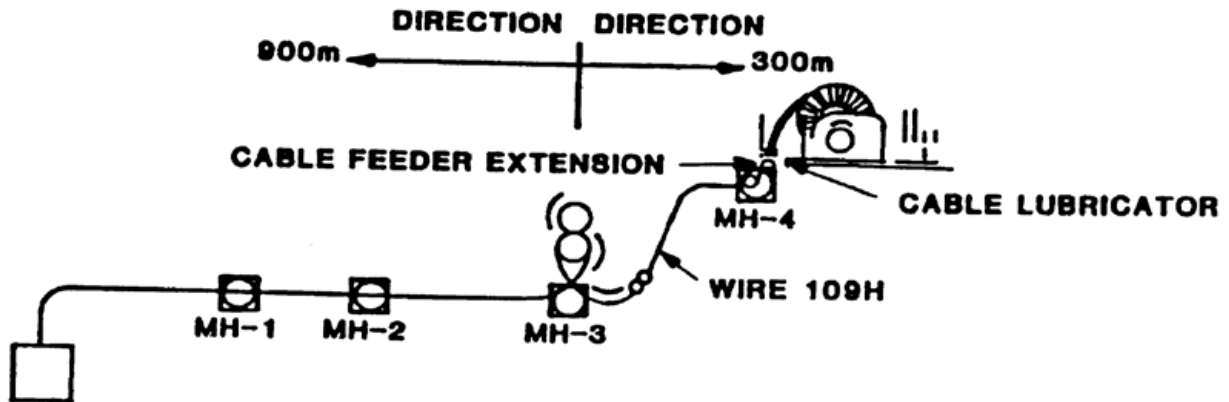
Bi-directional Cable Placing Method from Pull-through Manhole
